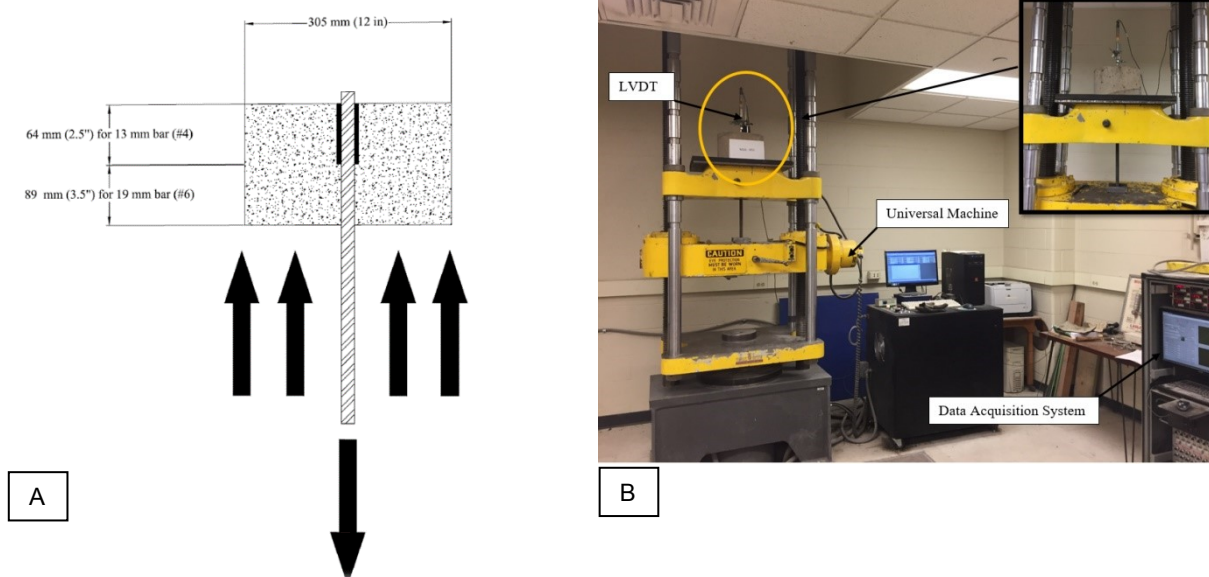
(A) Specimen's Forces and Dimensions, (B) Test setup
